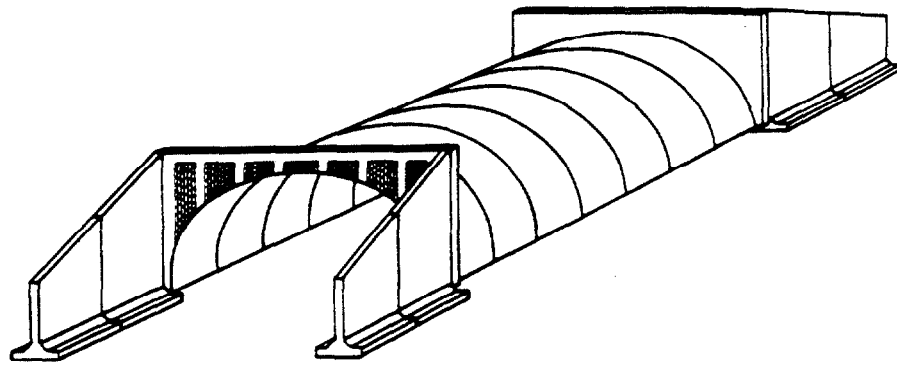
BEBO™ precast concrete arch.<sup>(9)</sup>
